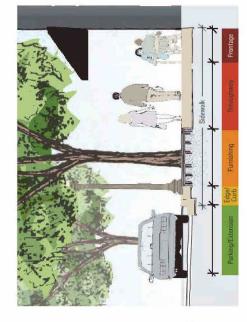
Sidewalk Zones Section Source: SF Better Streets Plan
